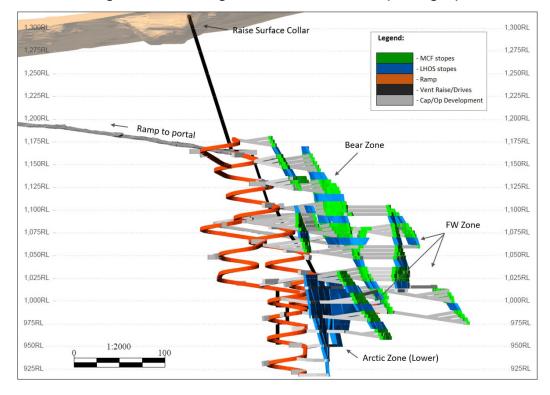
Bermingham Mine Isometric View Showing FW Zone (Looking NE)
